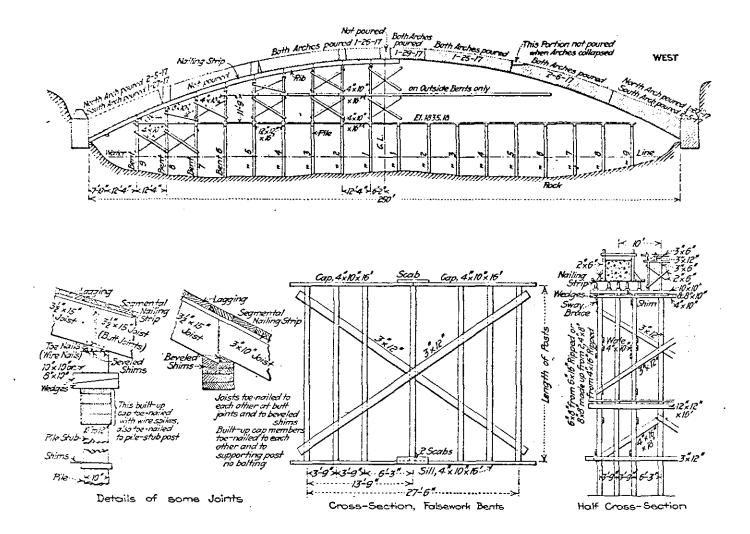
Details of Spokane River Bridge showing progress of construction and falsework (90)
